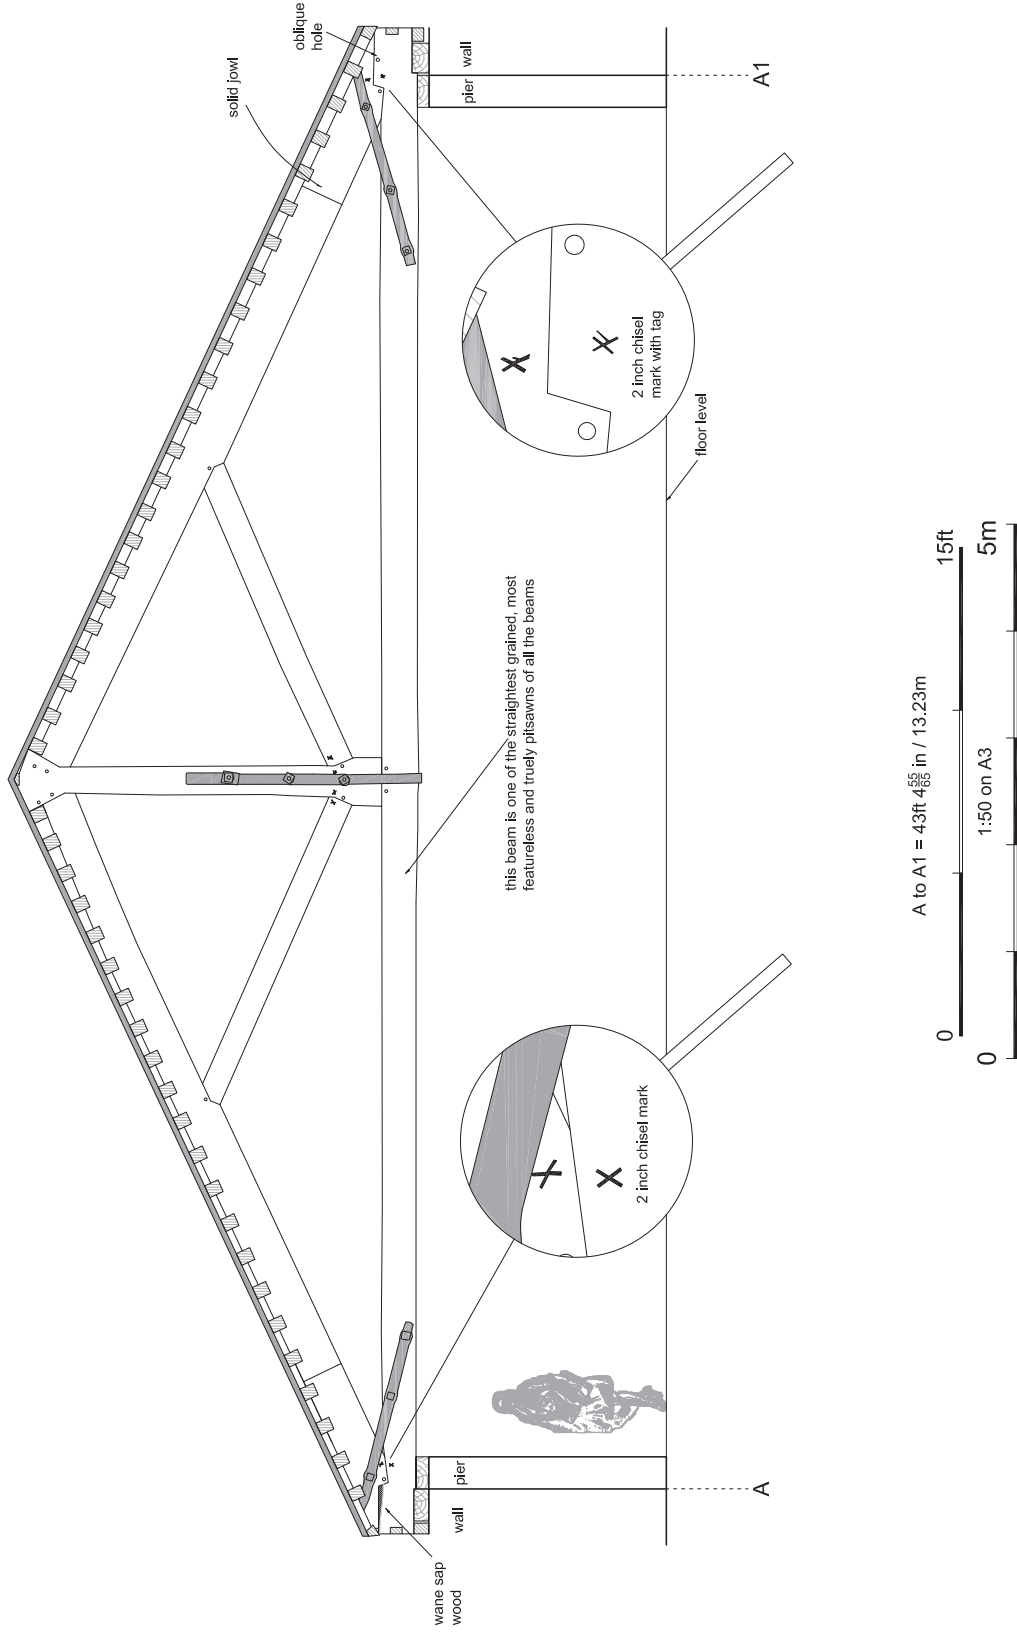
Elevation of the east face of Truss 4, main central roof of the nave of St Pauls cathedral, showing its form with a long, horizontal, single piece tie beam, King post, carpenters truss and joint numbers and original iron reinforcing straps.
